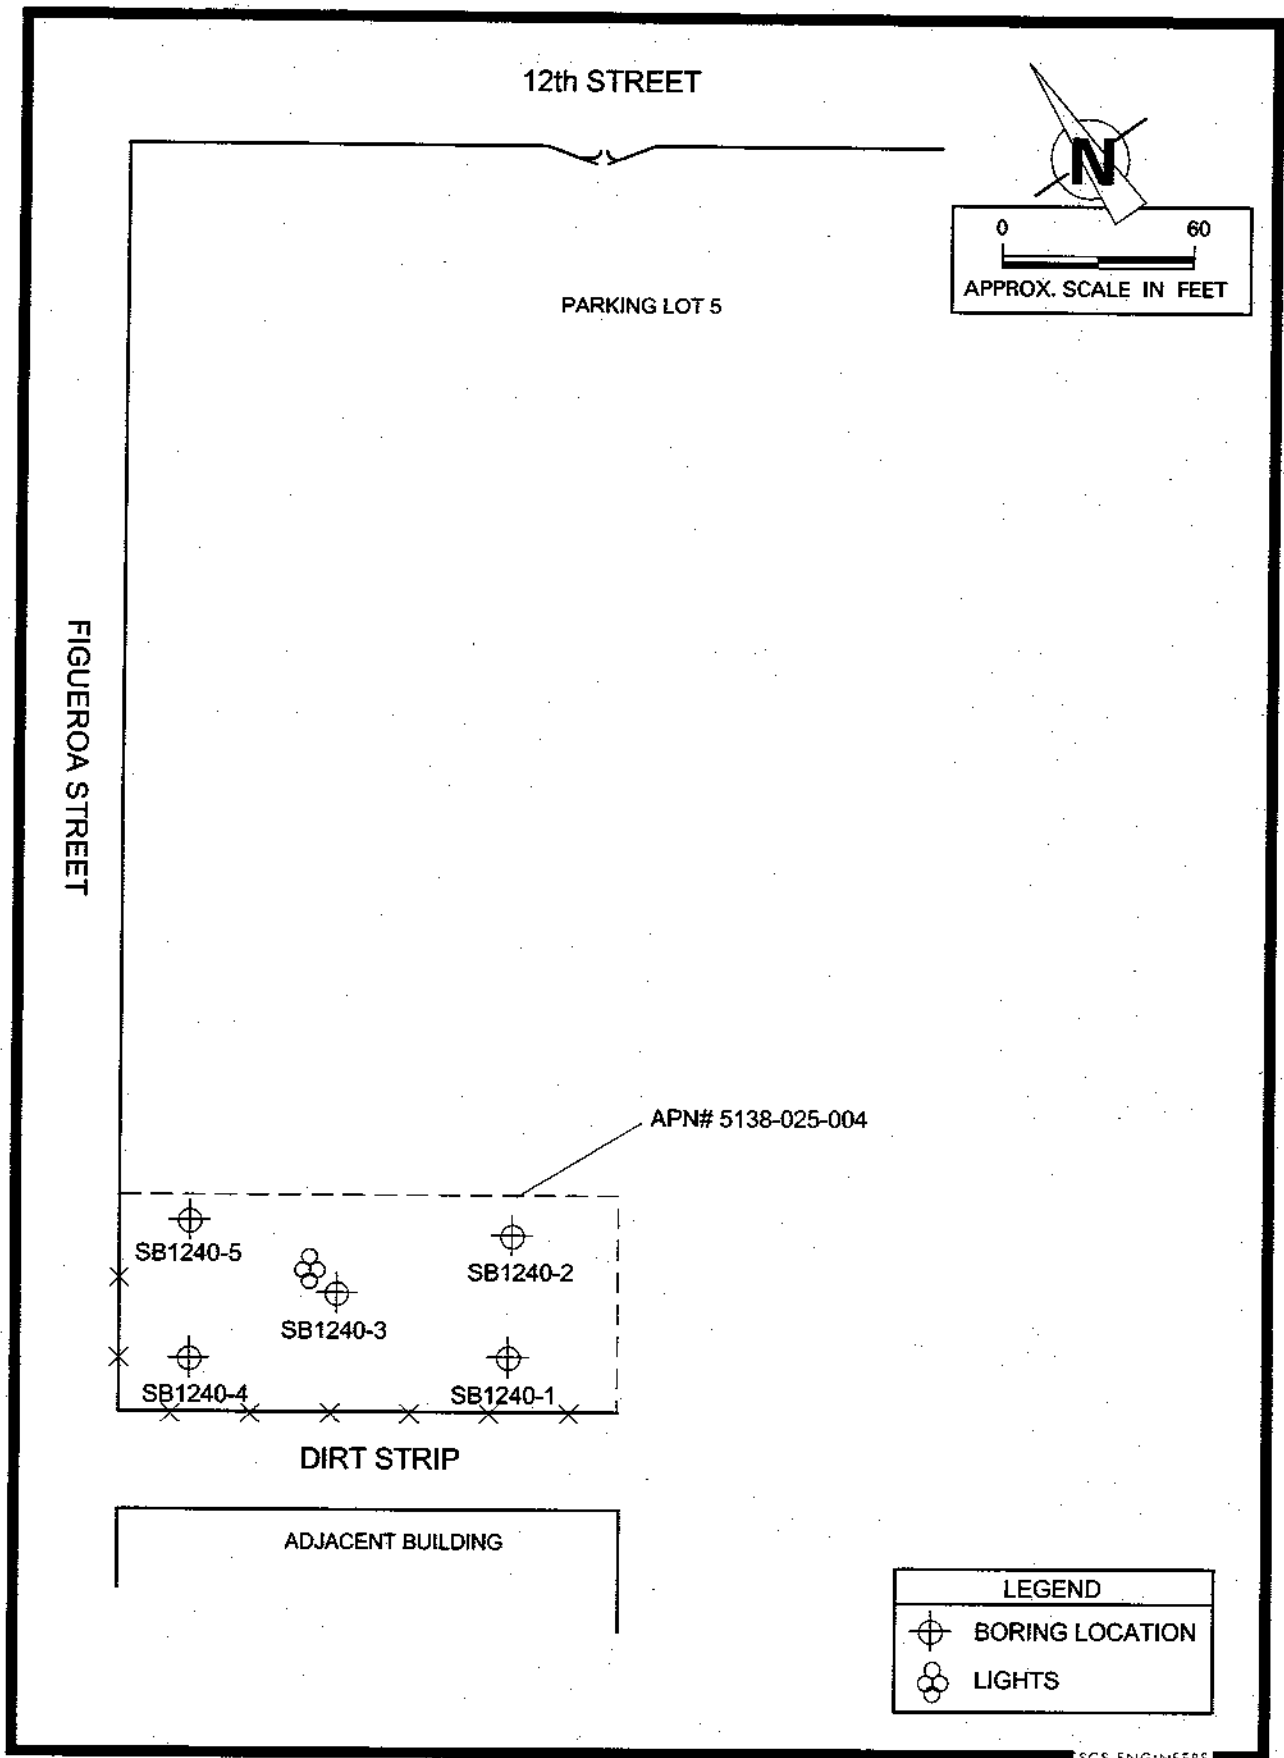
Soil Boring Locations, Parking Lot 5, 1240 South Figueroa (APN # 5138-025-004).
